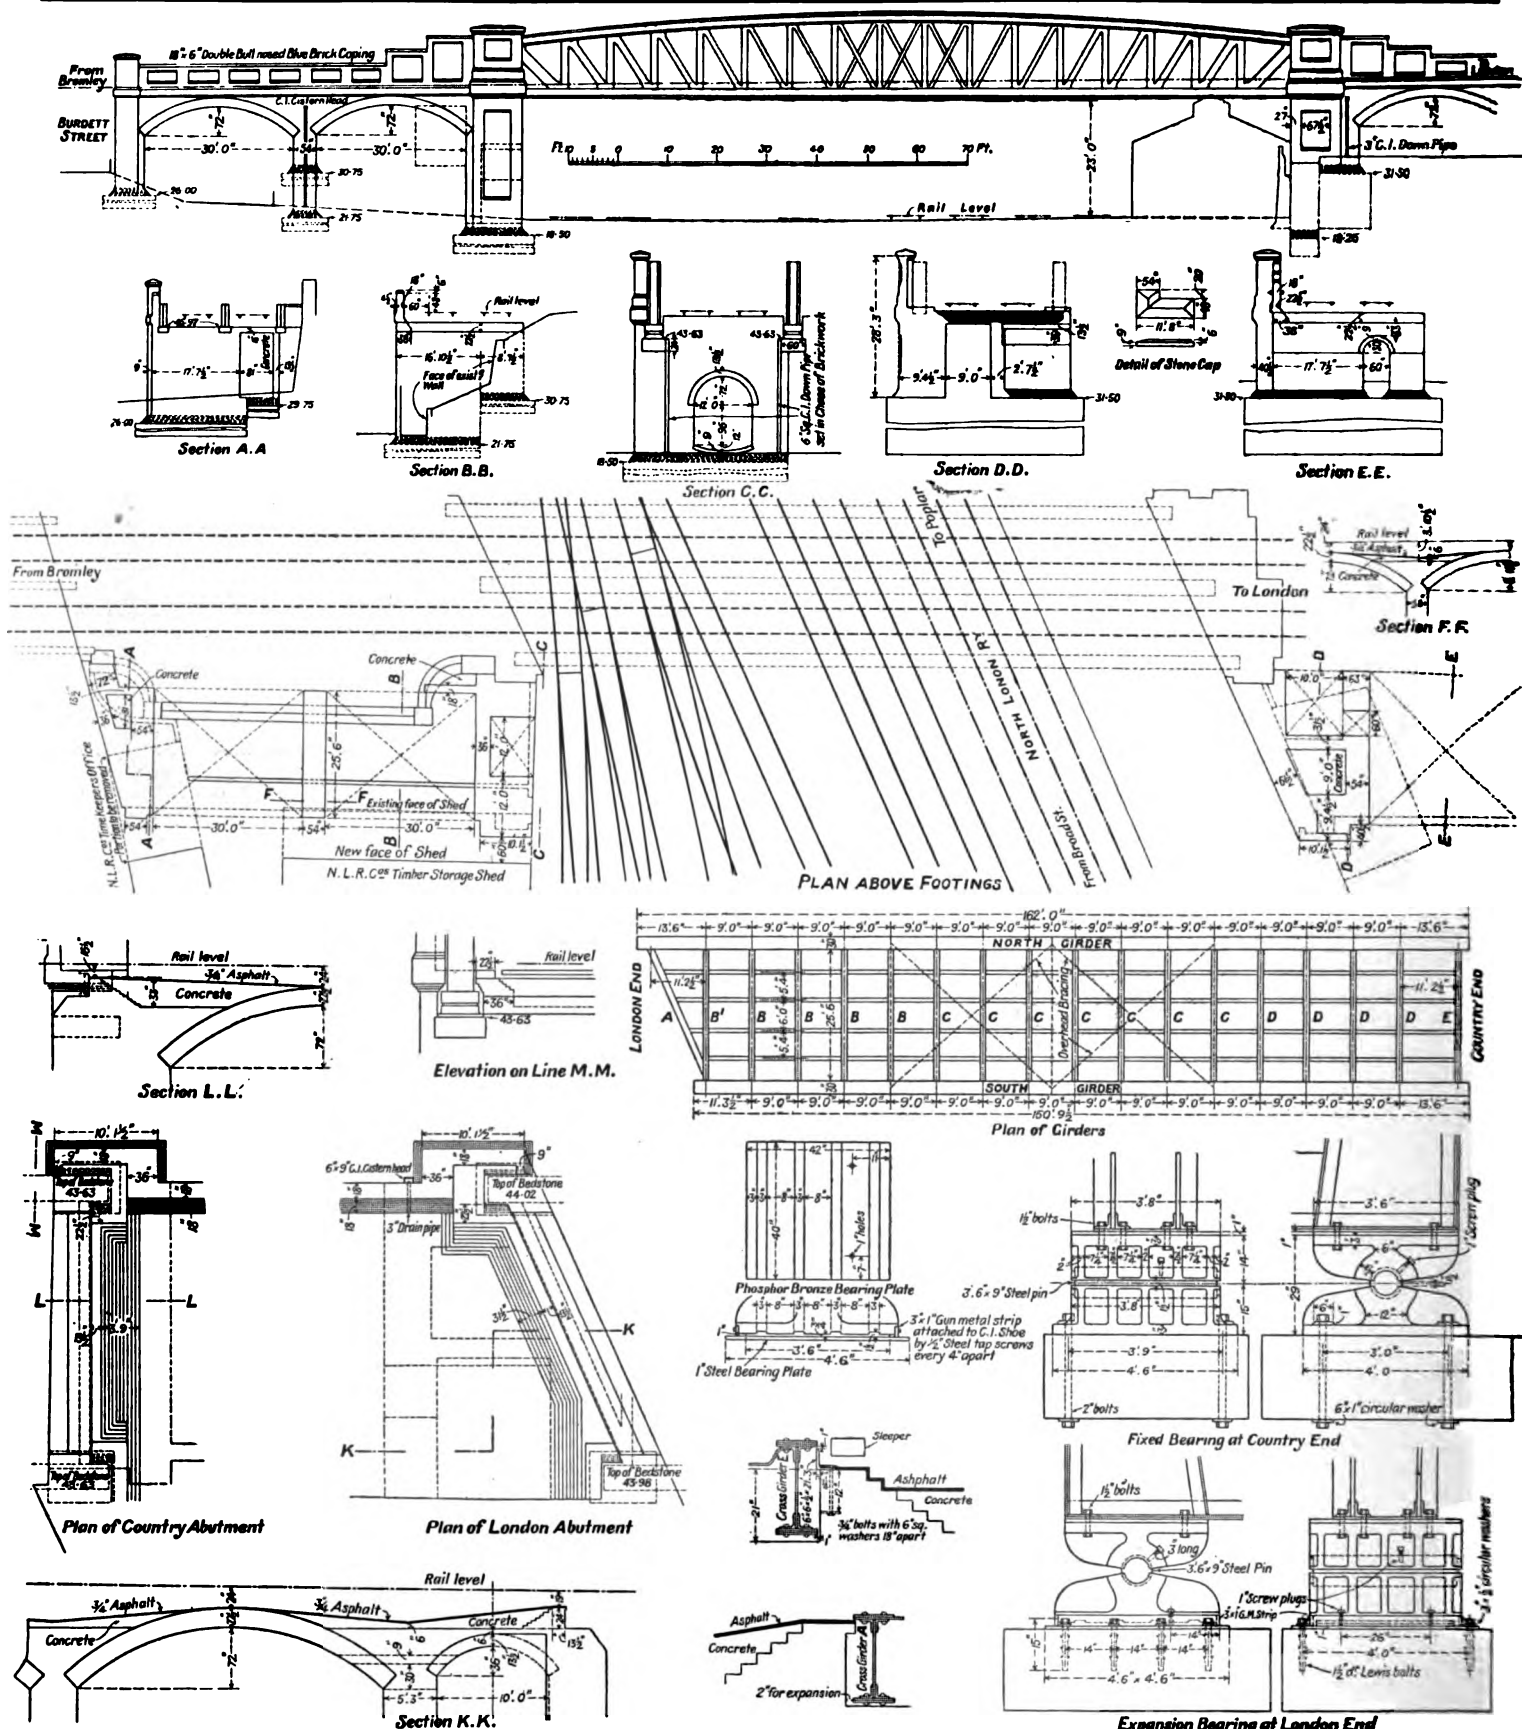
Bridge over North London Railway. Details of Brickwork and Bearings. Bow to East Ham Widening; L.T. & S.R.
